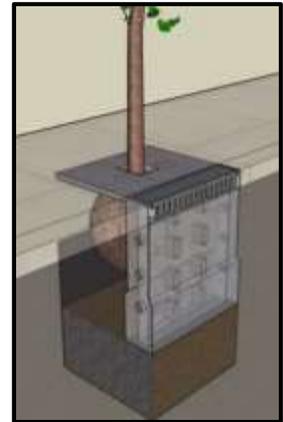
Street trees can help store water below the street, provide shade, and improve aesthetics
